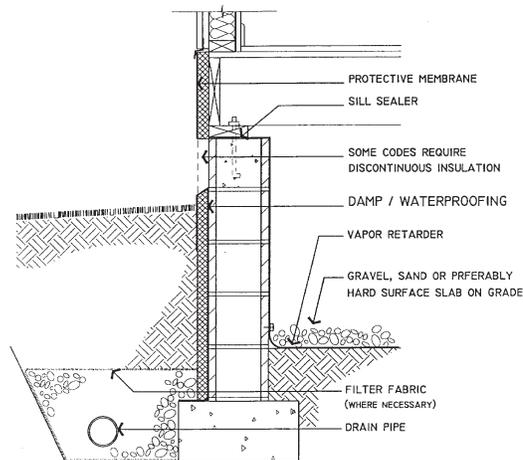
CONCRETE MASONRY CRAWL SPACE WALL WITH EXTERIOR INSULATION
